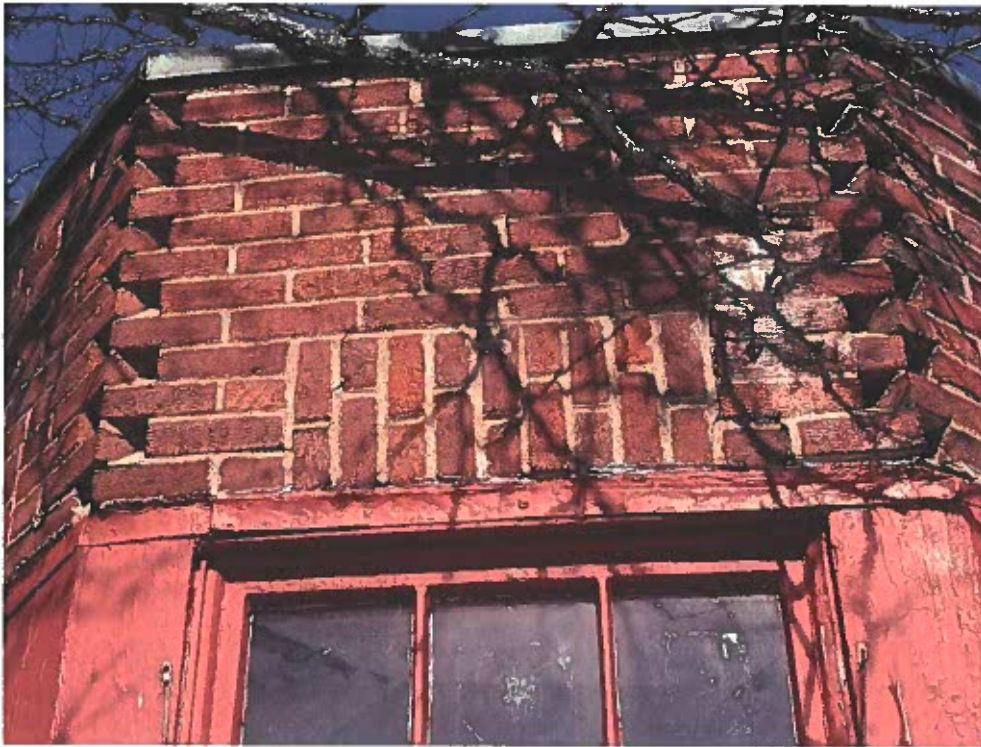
Diagonal cracking above front lintel assembly.
